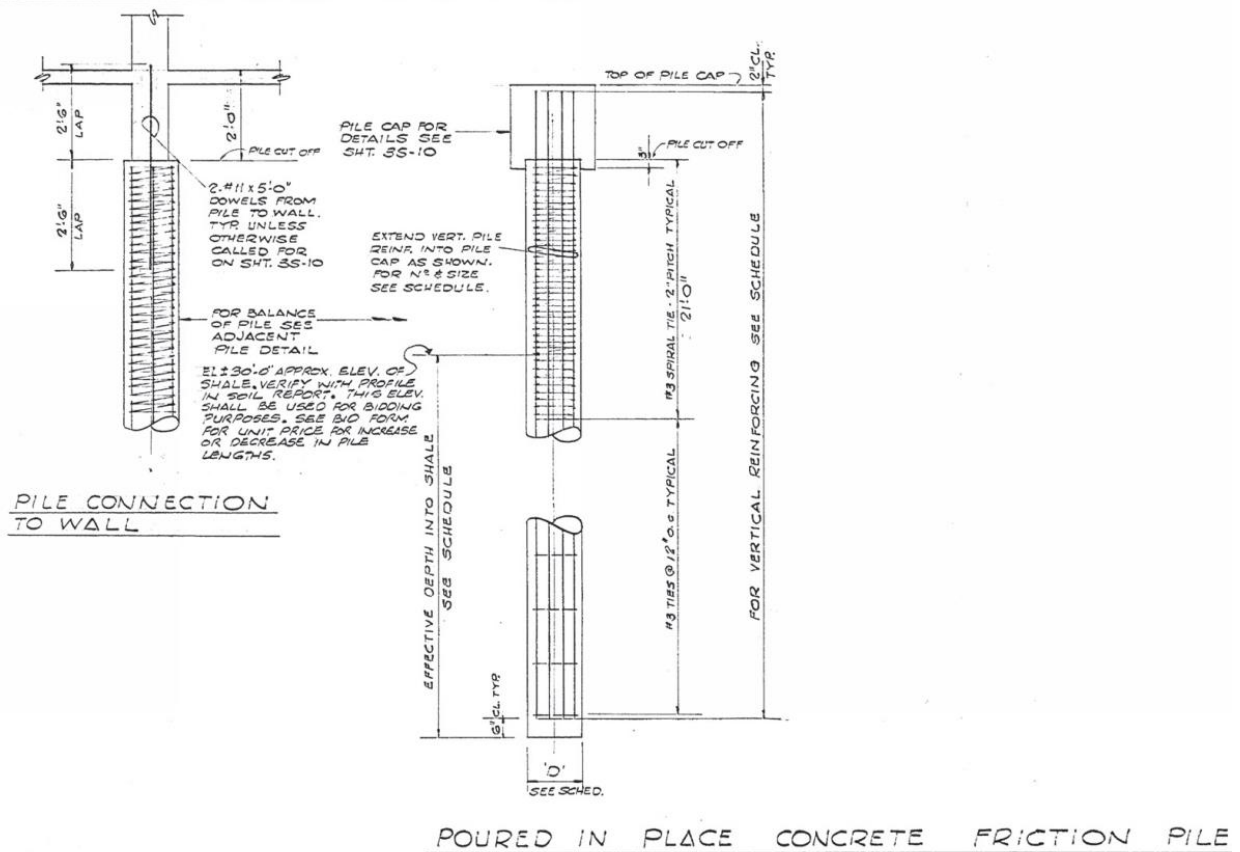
Existing pile reinforcement (excerpt from the original construction documents).
